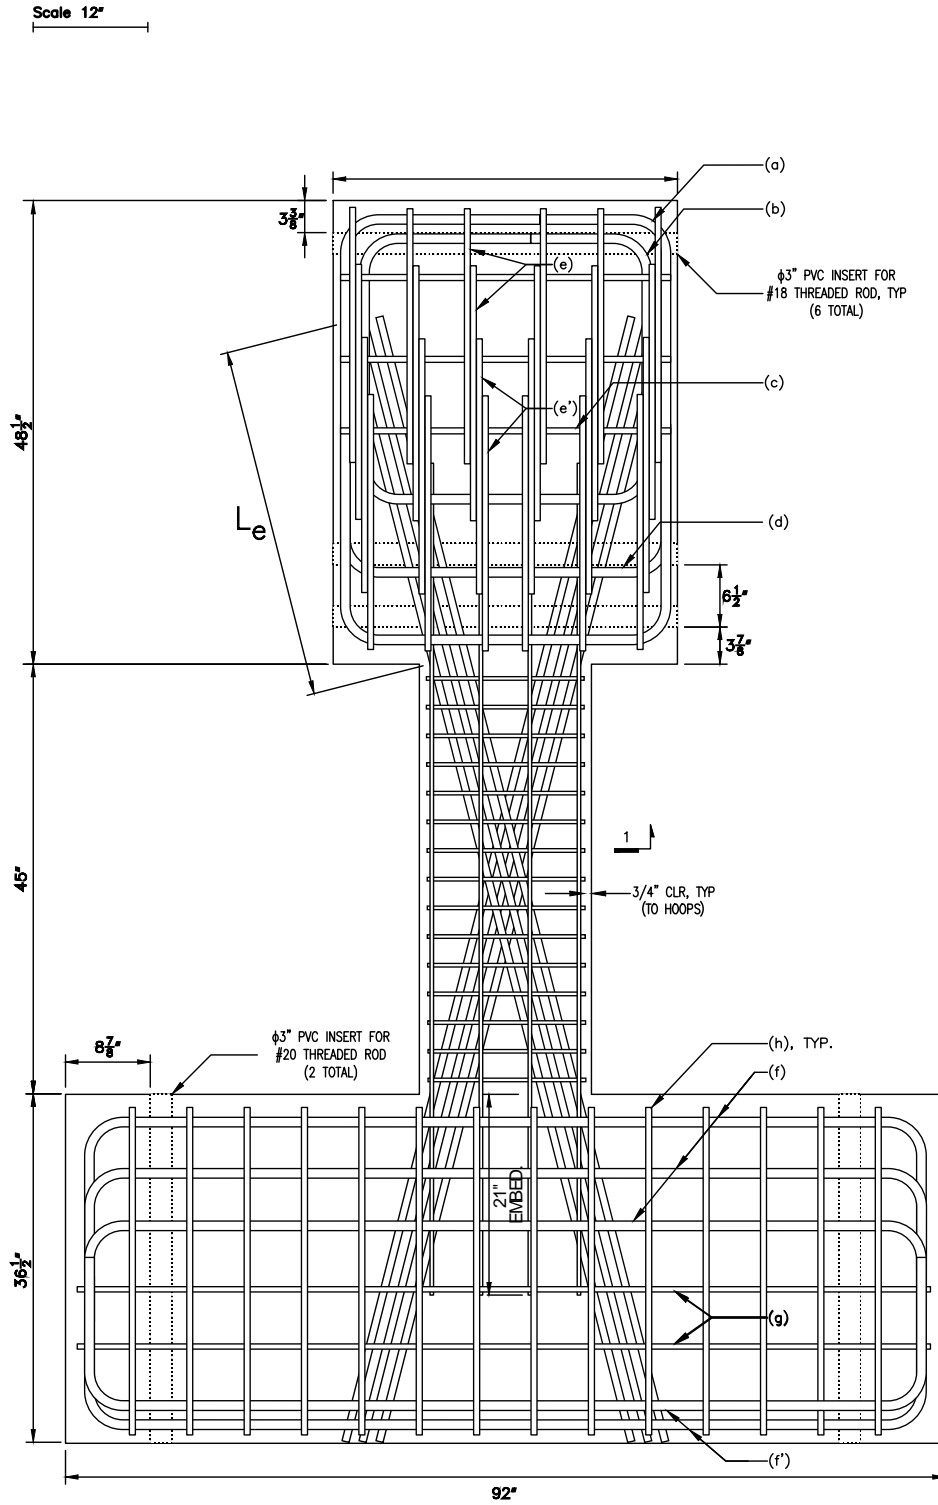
Elevation view of D120-2.5 (1 in. = 25.4 mm)
